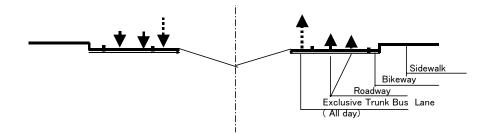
Typical Cross Section Location of Exclusive Trunk Bus Lane
